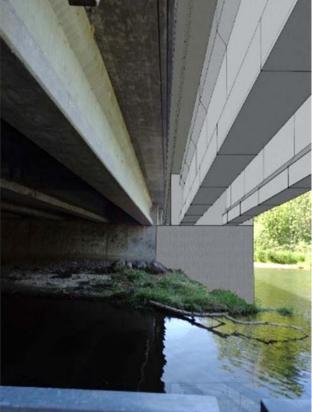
(Right): Rendering in photo showing proposed bike/ped bridge adjacent to existing bridge.
